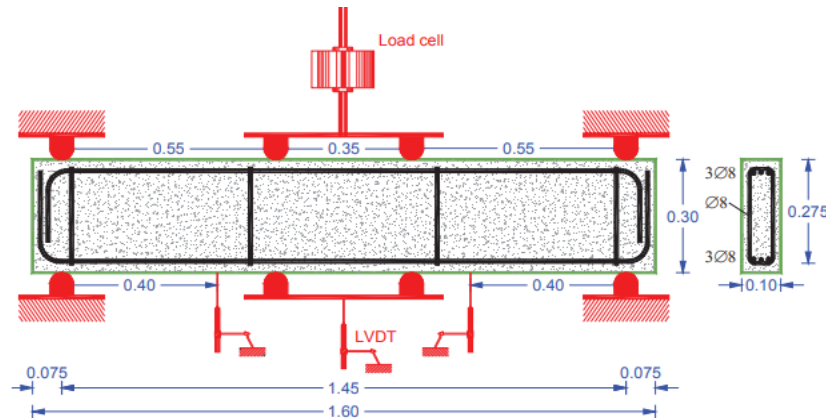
Characteristic test setup and steel reinforcement of the tested beams [14]
